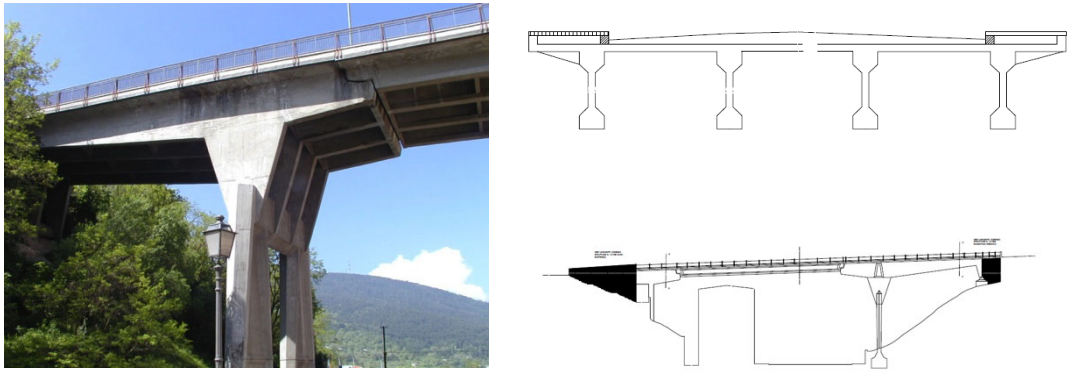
The Belvedere Bridge in L'Aquila downtown (left), technical drawings (right).
